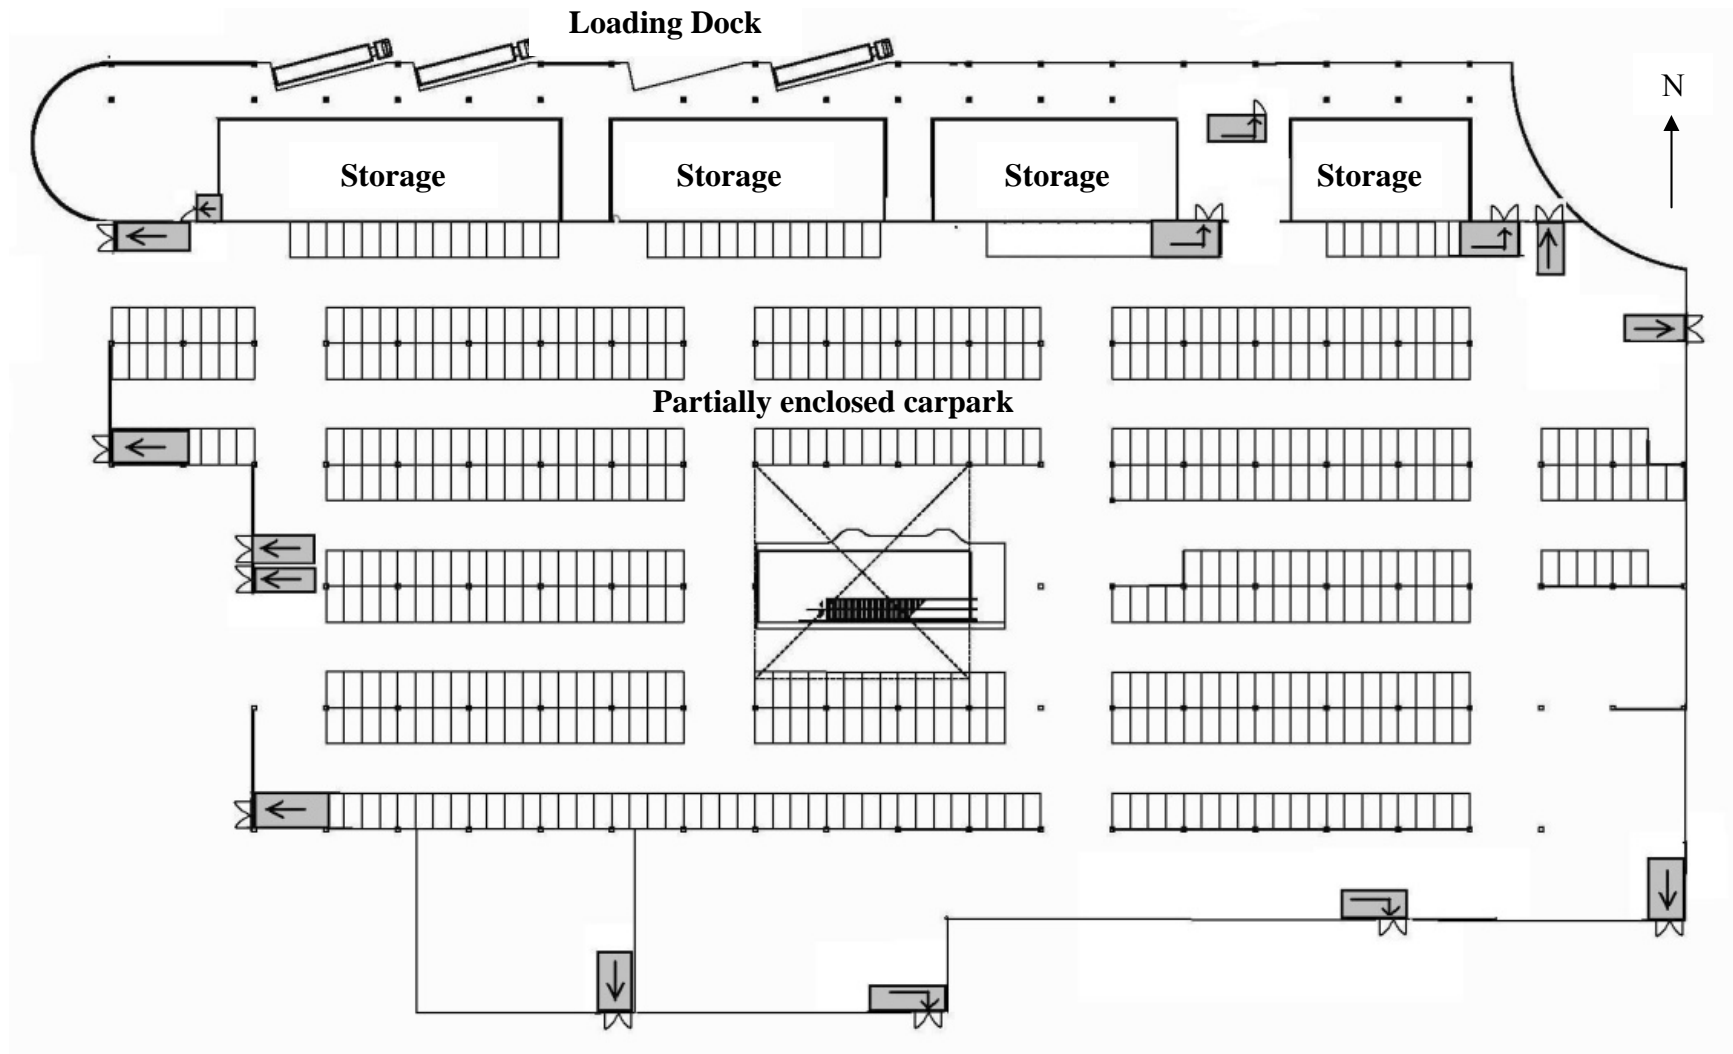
Plan view of floor 1 in shopping mall (not to scale)
